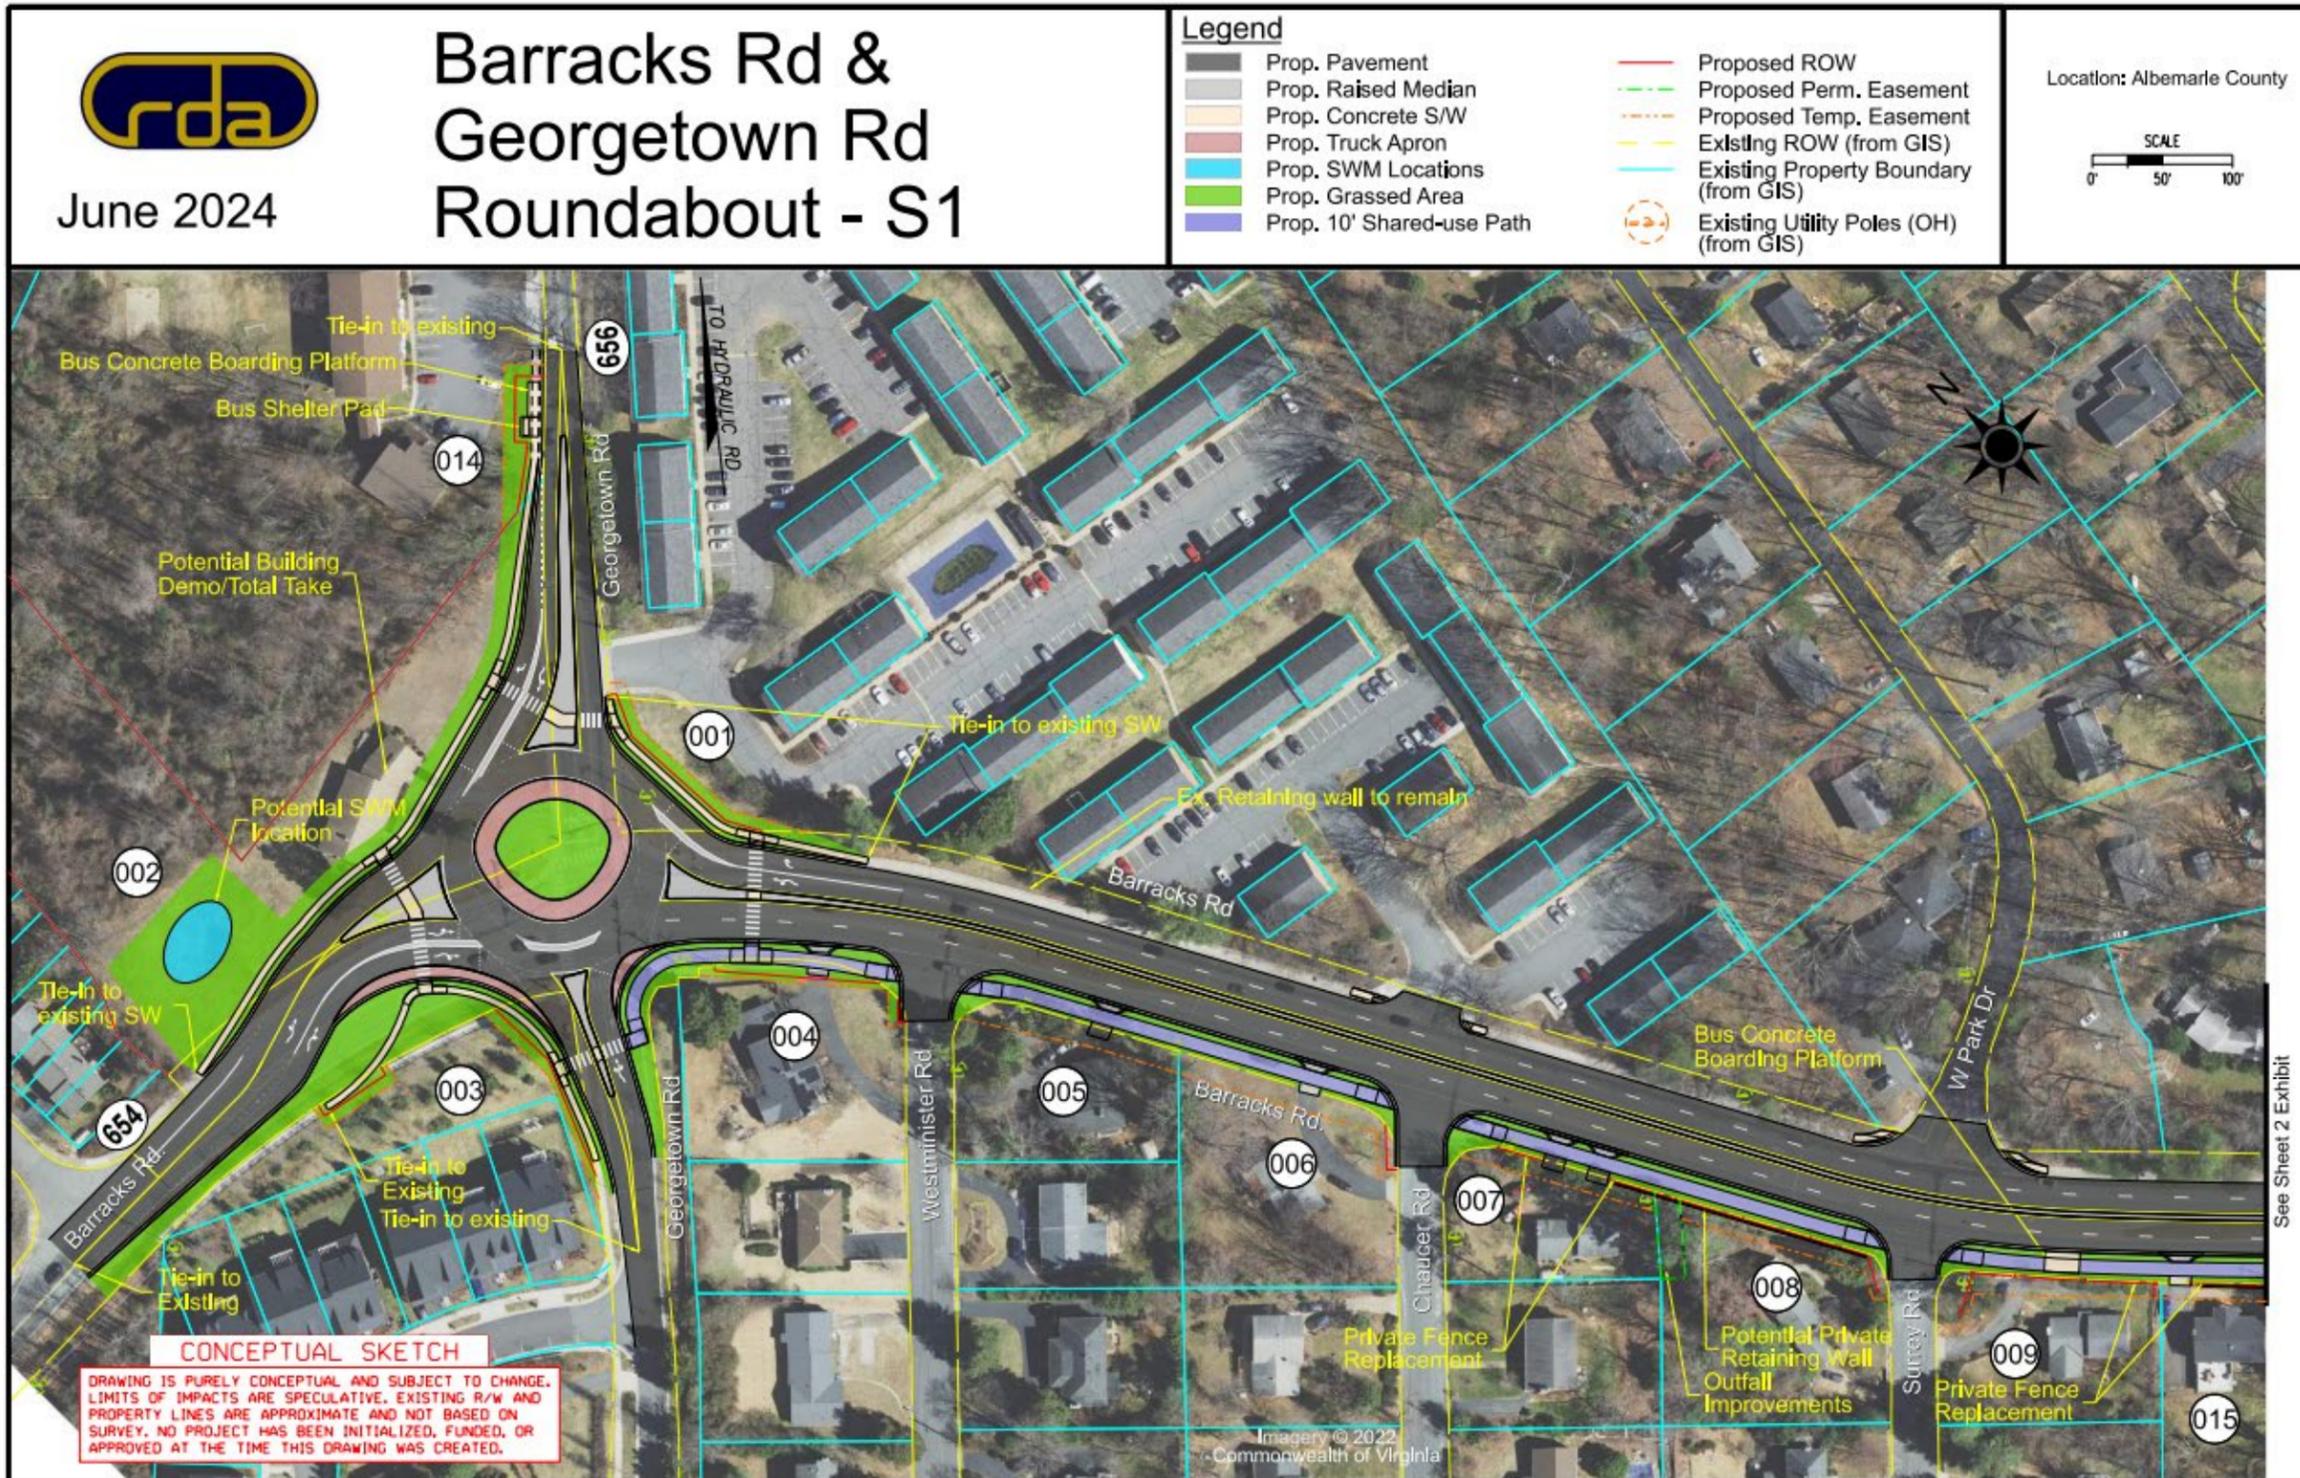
Barracks Road (Route 654) – Layout for Concepts 2
